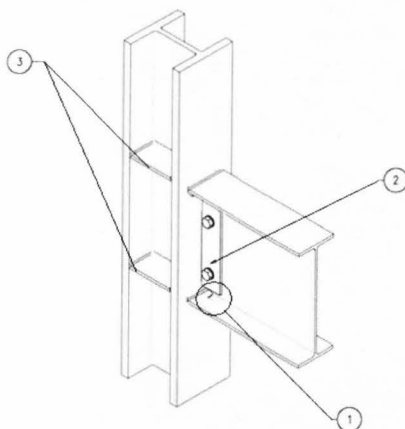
WUF-B connection: 1) flange weld, 2) bolted shear tab, and 3) continuity plates.
